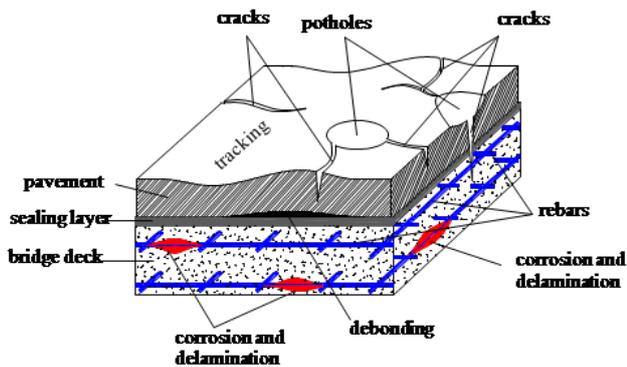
Some common defects and deteriorations found in concrete bridge decks with asphalt pavement overlay
